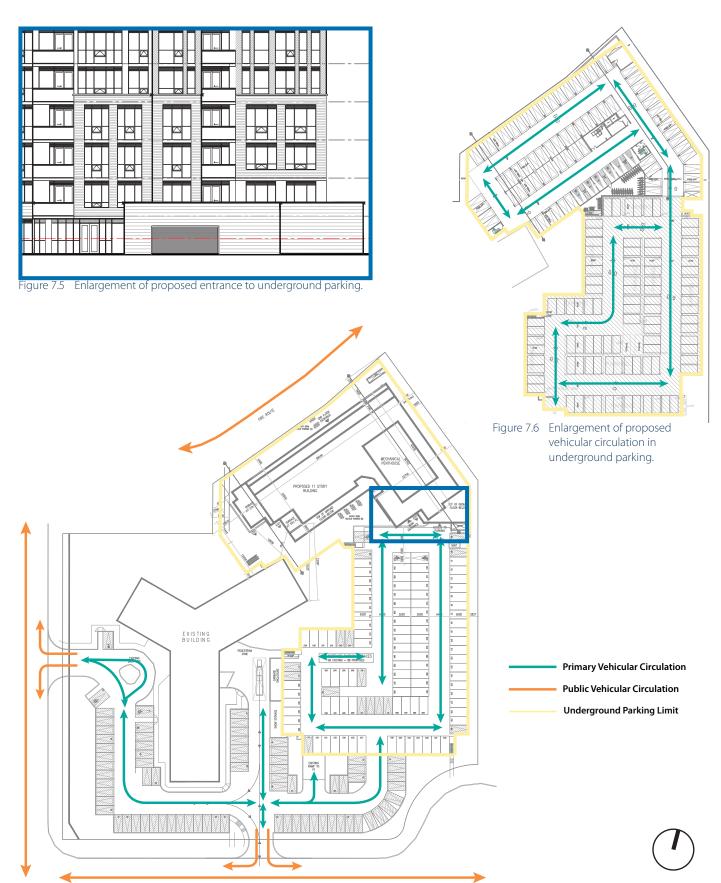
Site plan illustrating vehicular circulation for both public and private on Site Plan prepare by architectureunfolded.
